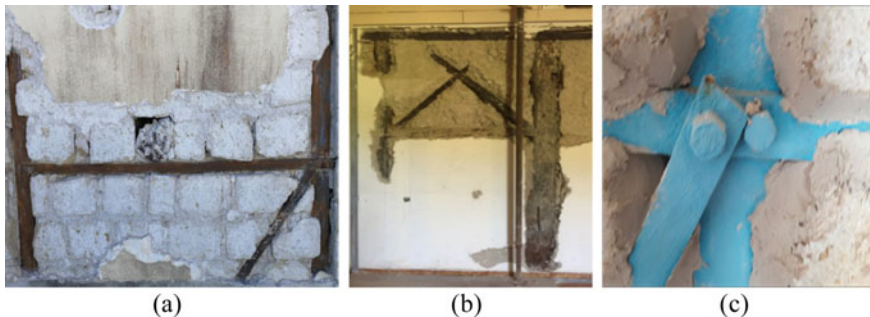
Details of constructive technique used in the Santa Maria Maddalena Church: a ‘iron baraccato’ system, b ‘timber baraccato’ system, c bolted connection between iron profiles
